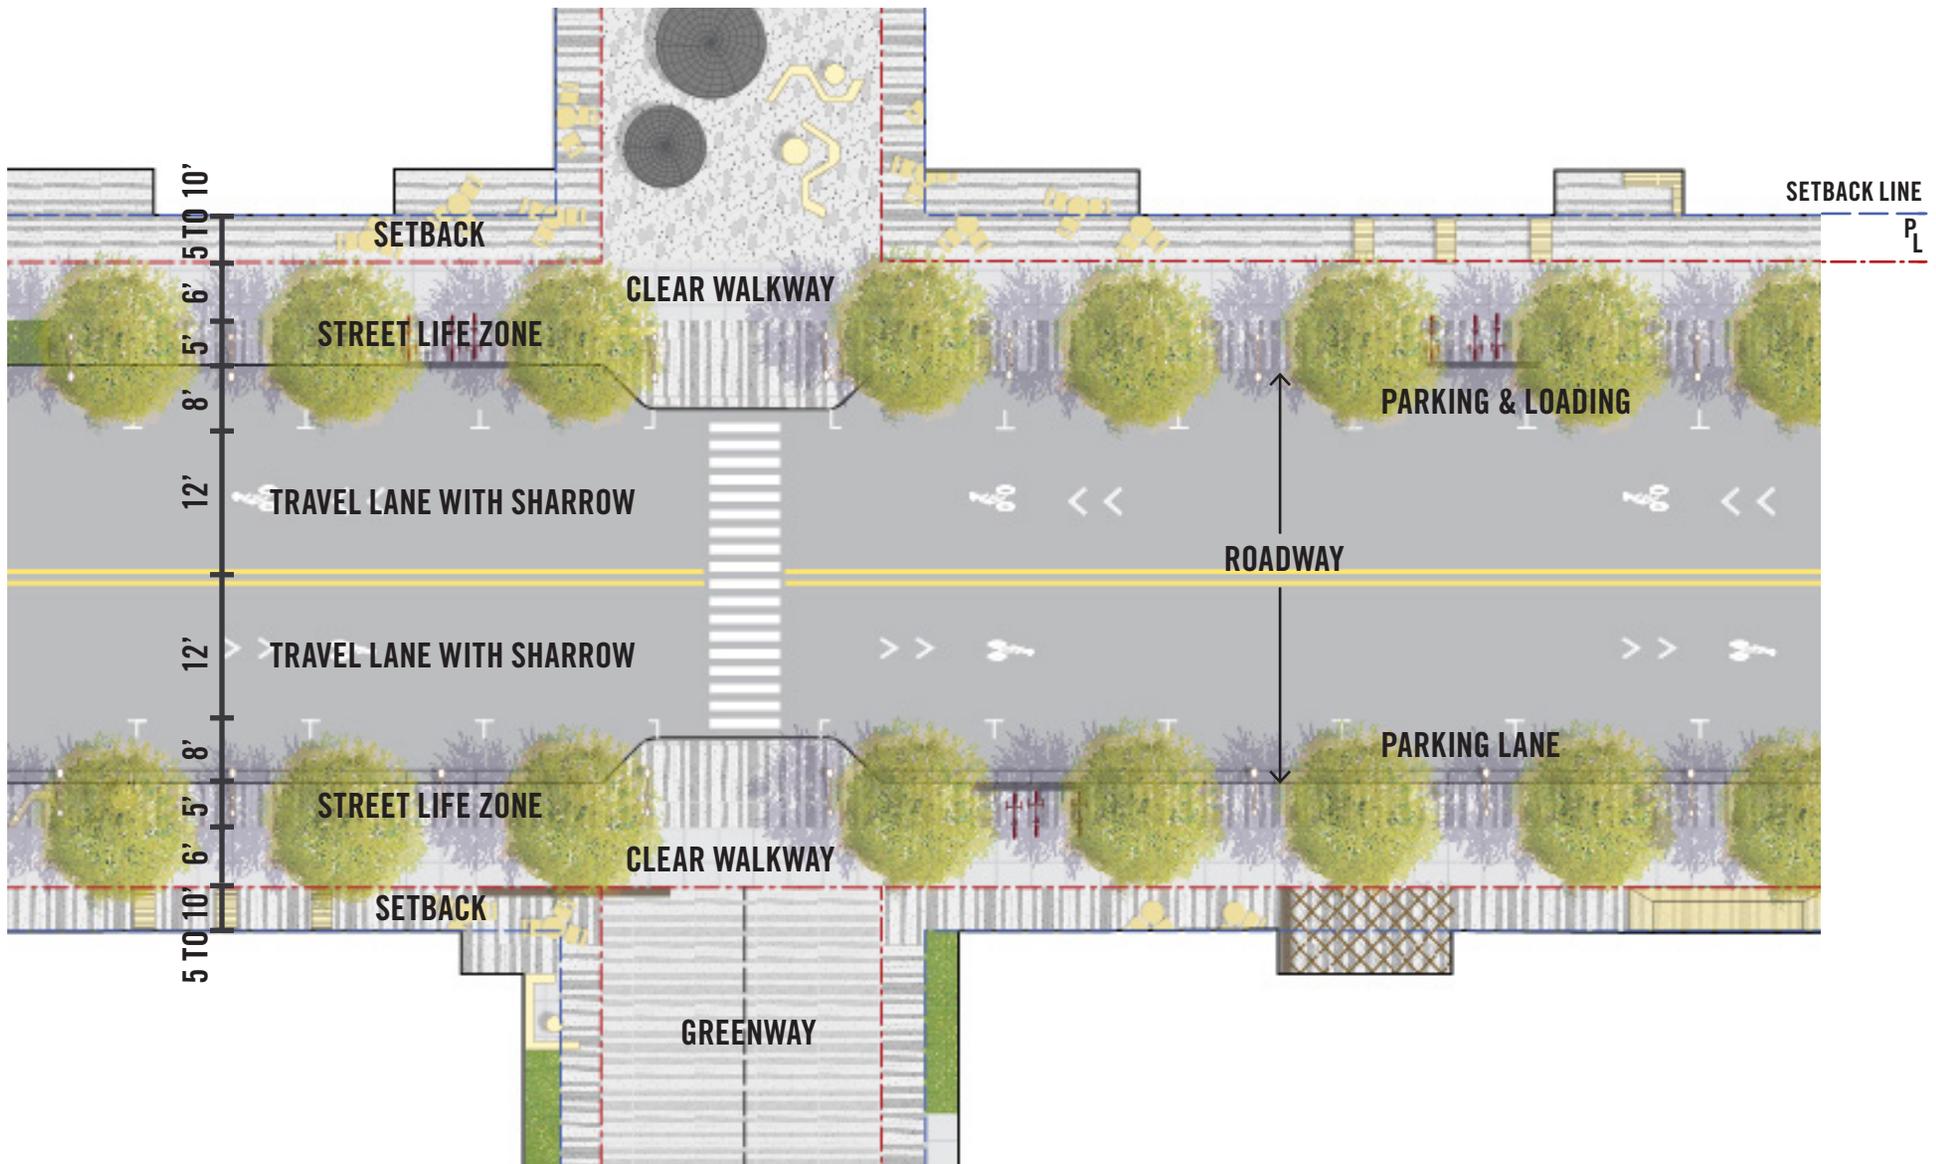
Calle Del Sol Street Plan: North of Calle de Luna
